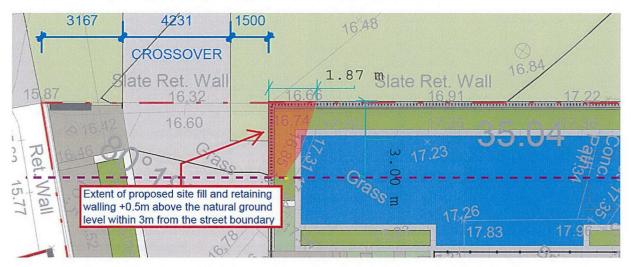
Extent of proposed site works and retaining wall height variations within 3m of the Odern Crescent street boundary.
